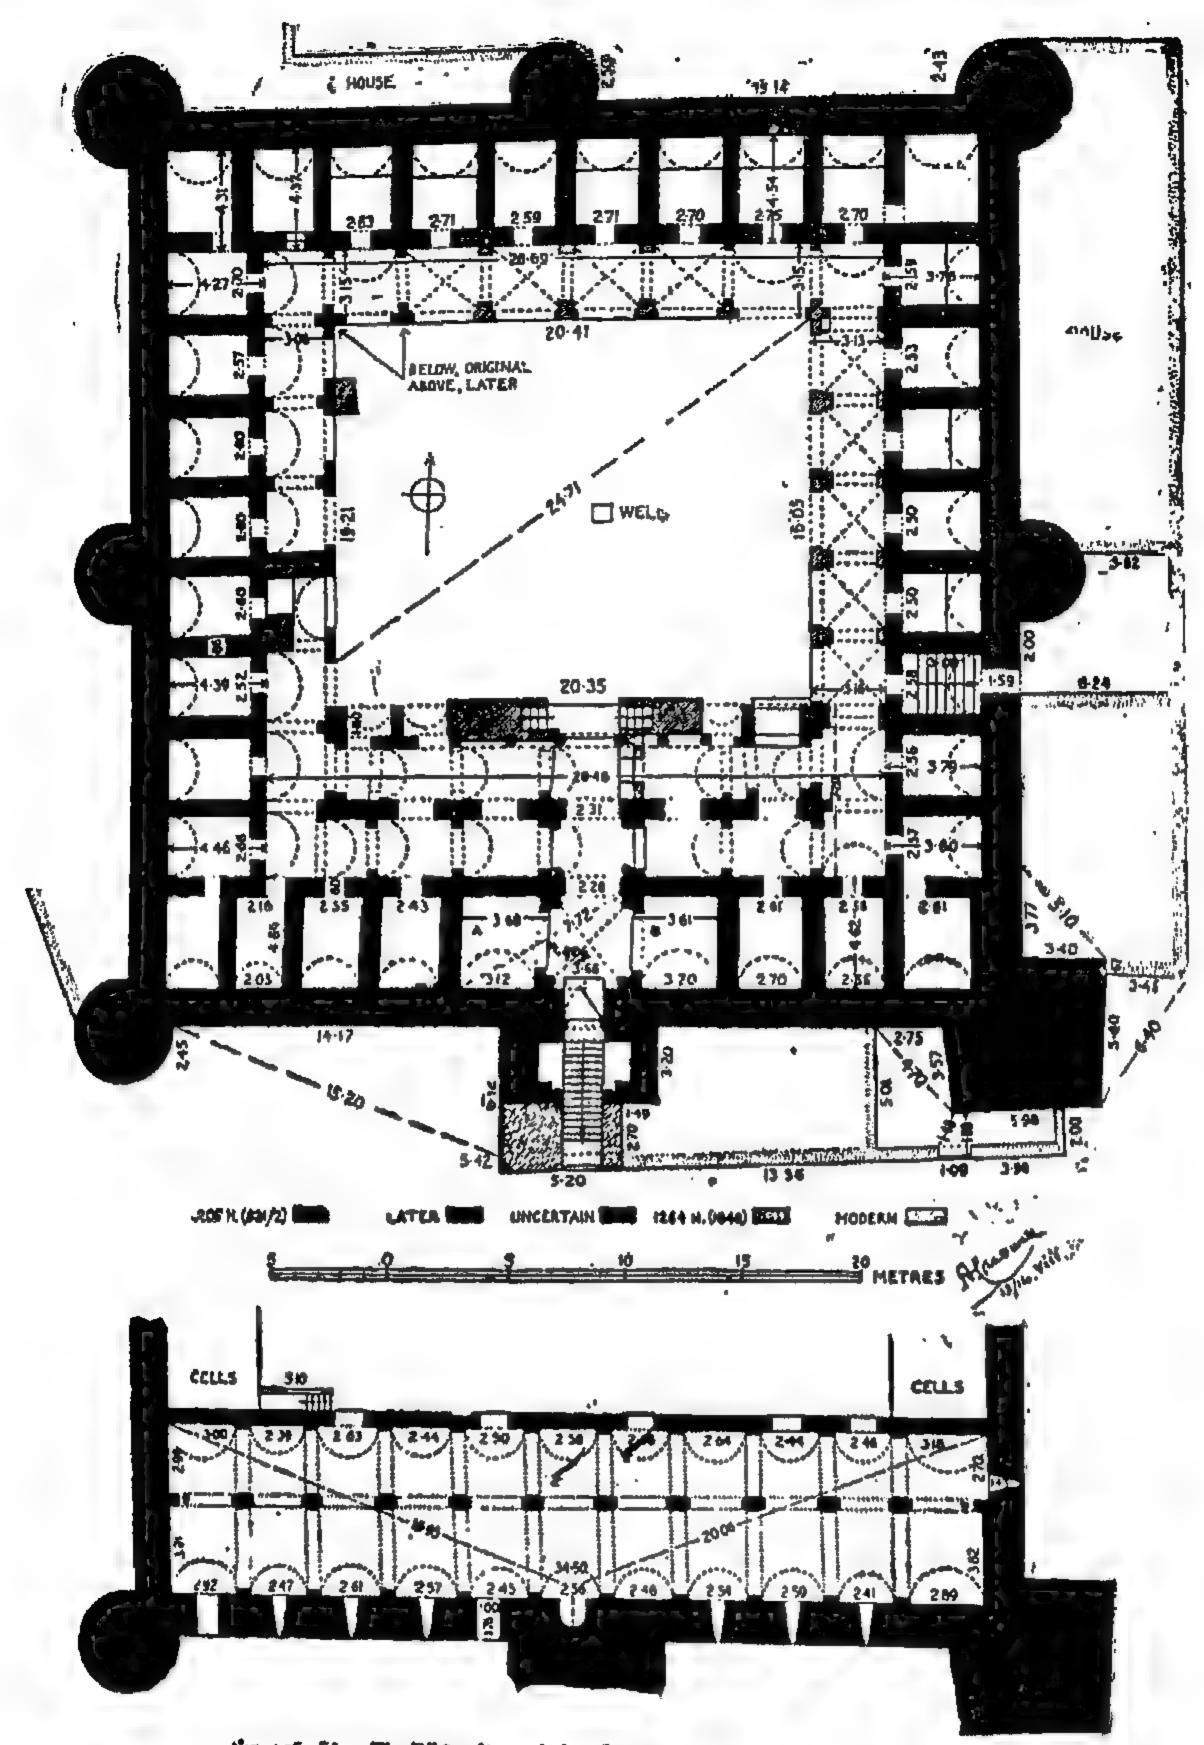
Sona: The Ribst, plan, and plan of mosque on first floor. Scale : : 200.
